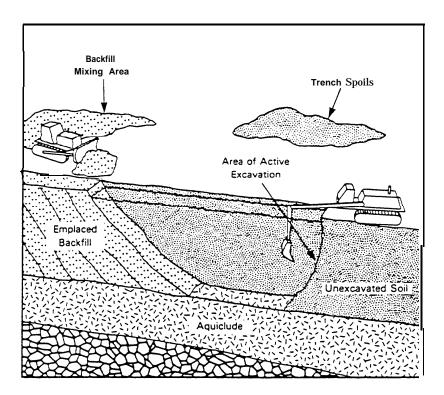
Cross-Section of a Soil-Bentonite Slurry Trench, Showing Excavation and Backfilling Operations (Spooner et al., 1985)
